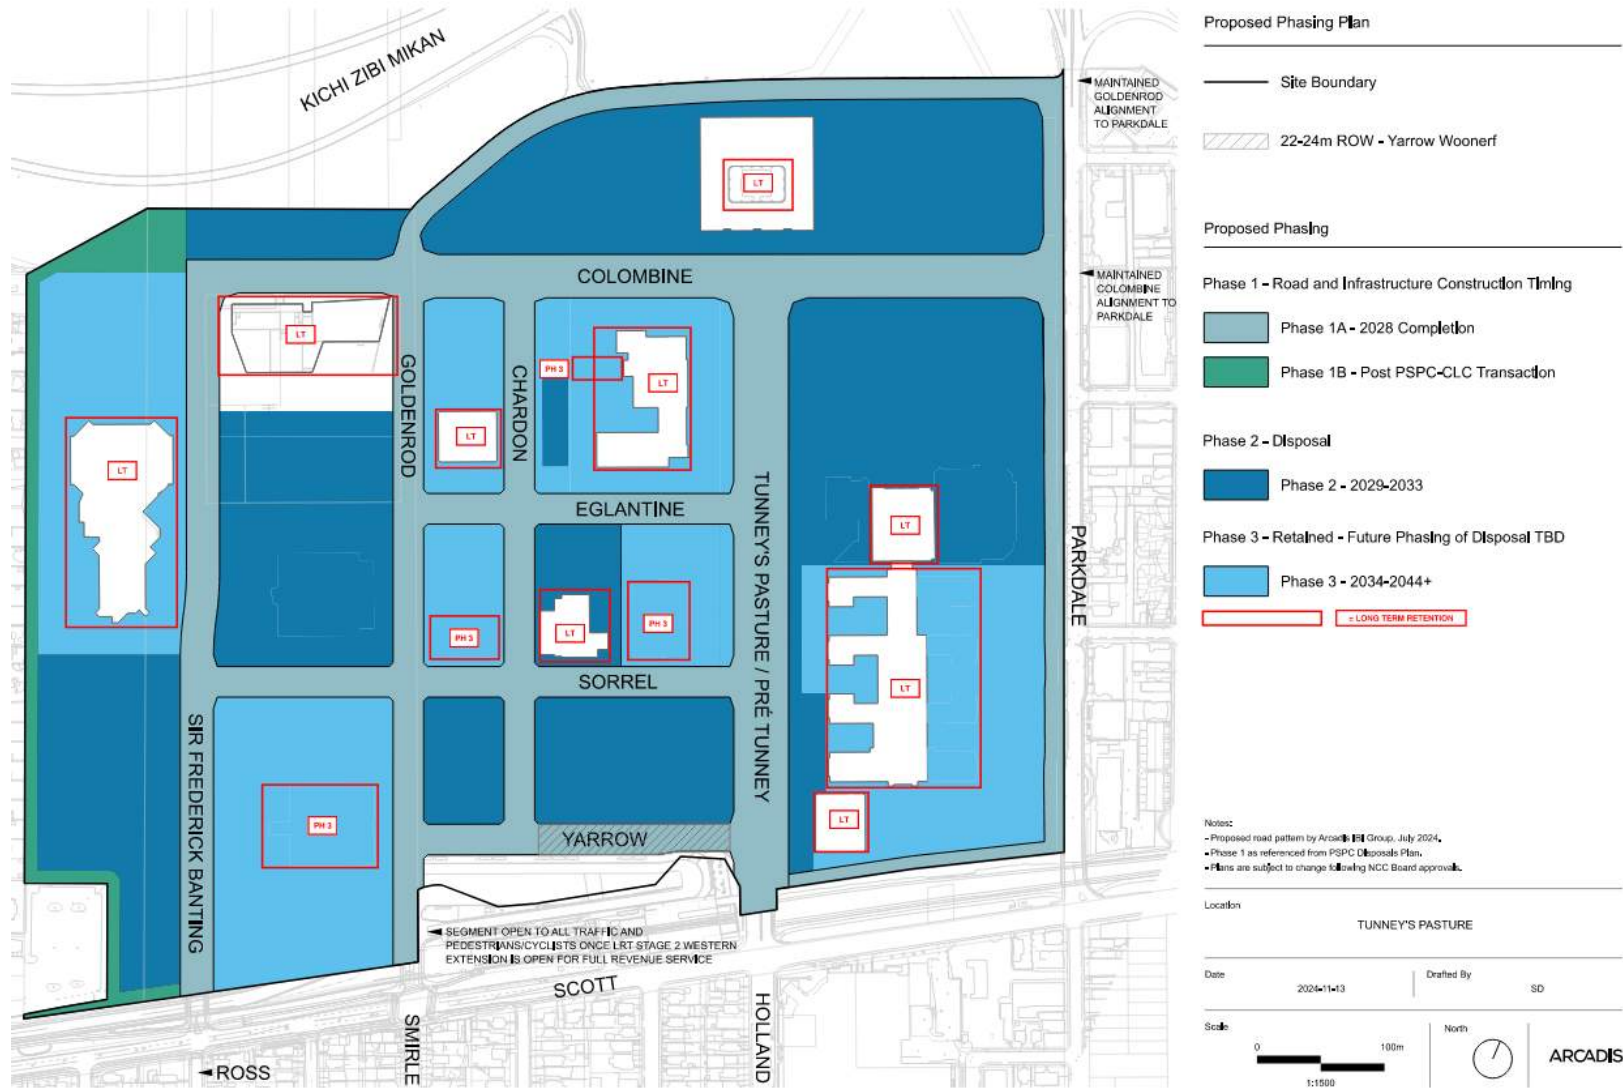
Proposed Phasing Plan via Arcadis (2024-11-13)
